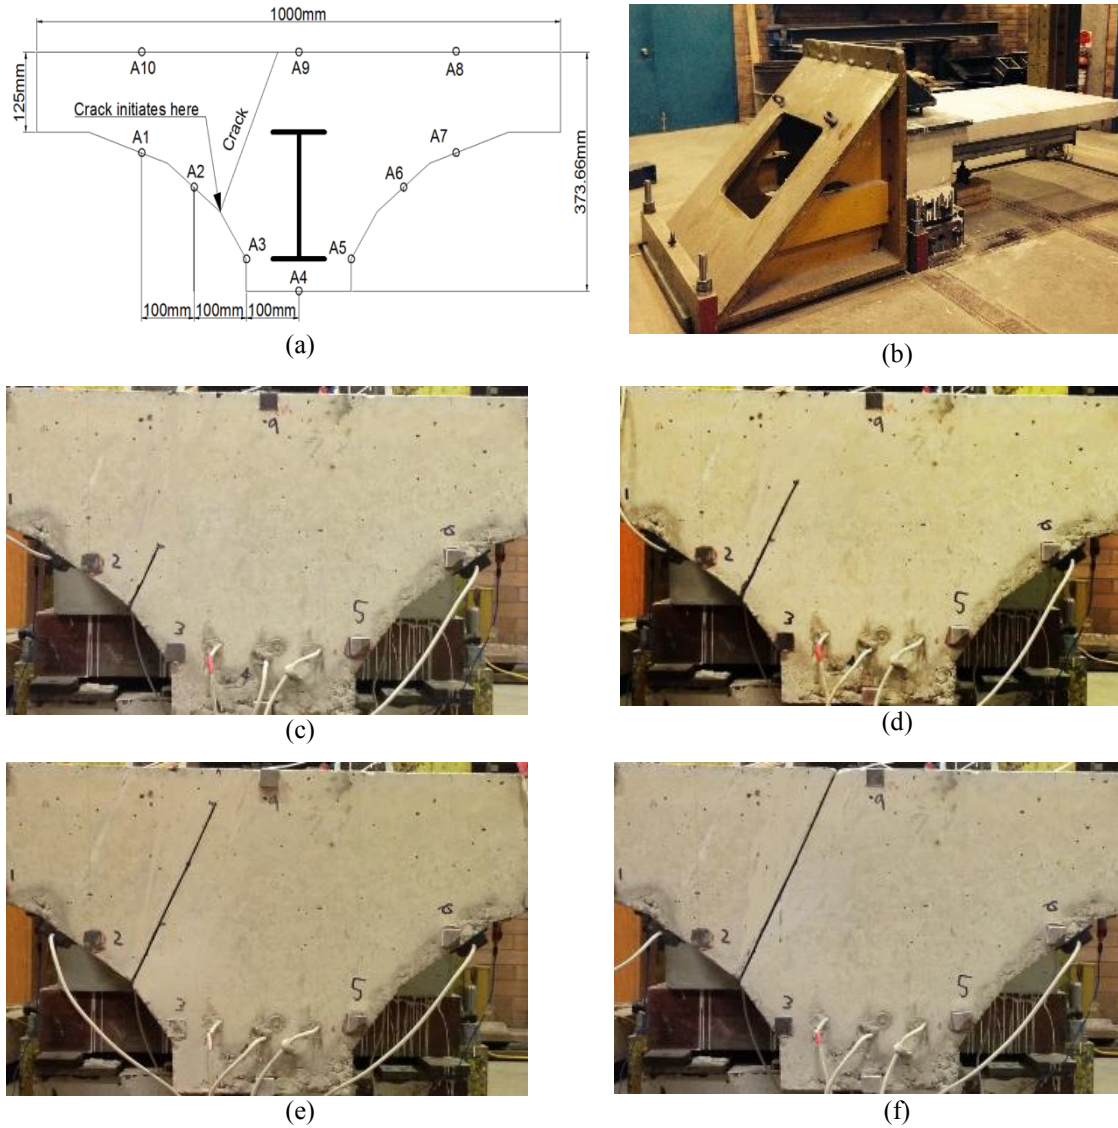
Test specimen: (a) intact structure with arrow indicating the cut, (b) support of the structure, (c) damage case 1: 75 mm damage cut, (d) damage case 2: 150 mm damage cut, (e) damage case 3: 225 mm damage cut and (f) damage case 4: 270 mm damage cut.
